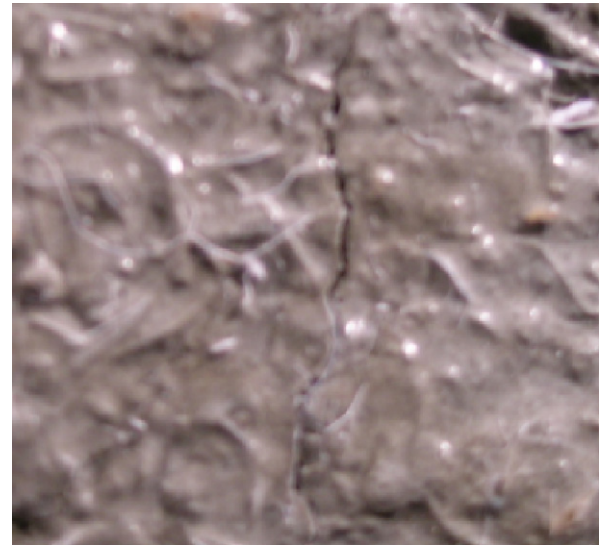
Plastic shrinkage crack in the steel–polyester hybrid concrete (HSPO4) slab (area 18×18 mm).
